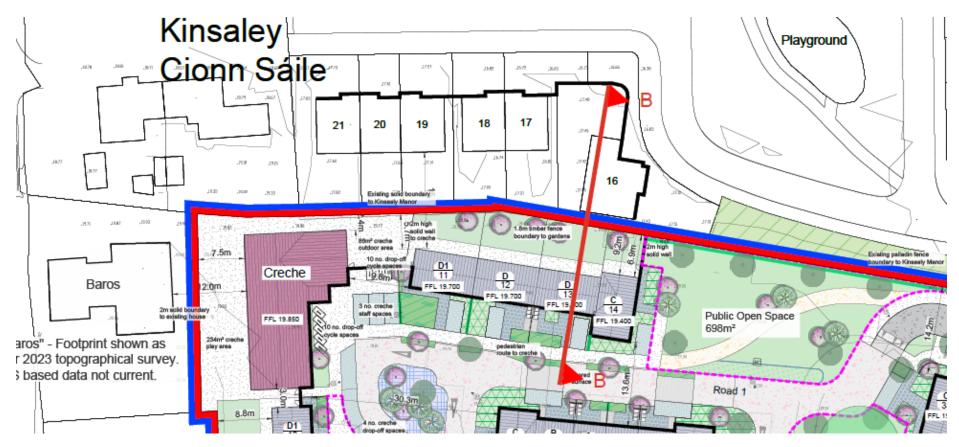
Plan showing section B-B through 16 Kinsealy Manor and proposed development
